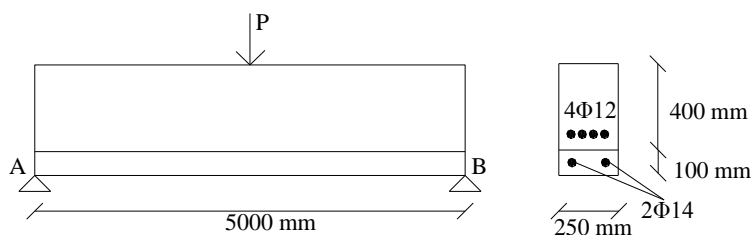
Geometry and load condition for the beam strengthened with concrete layer on the tensile side
